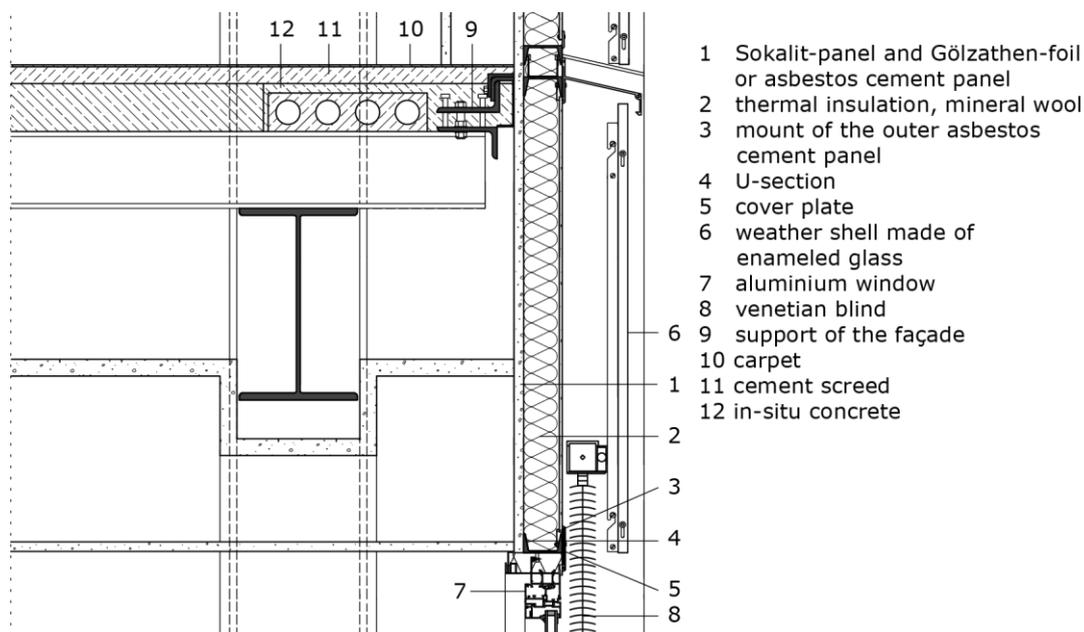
Vertical section through the façade of the investigated building after first refurbishment (1996).
